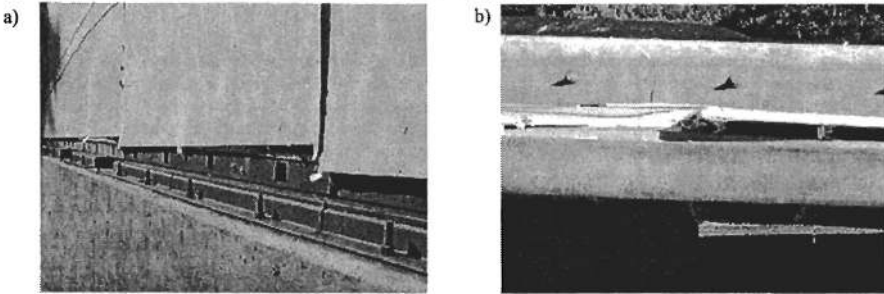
Failure of wall Amongyp: a) view at the bottom plate, b) view from the top plate.
